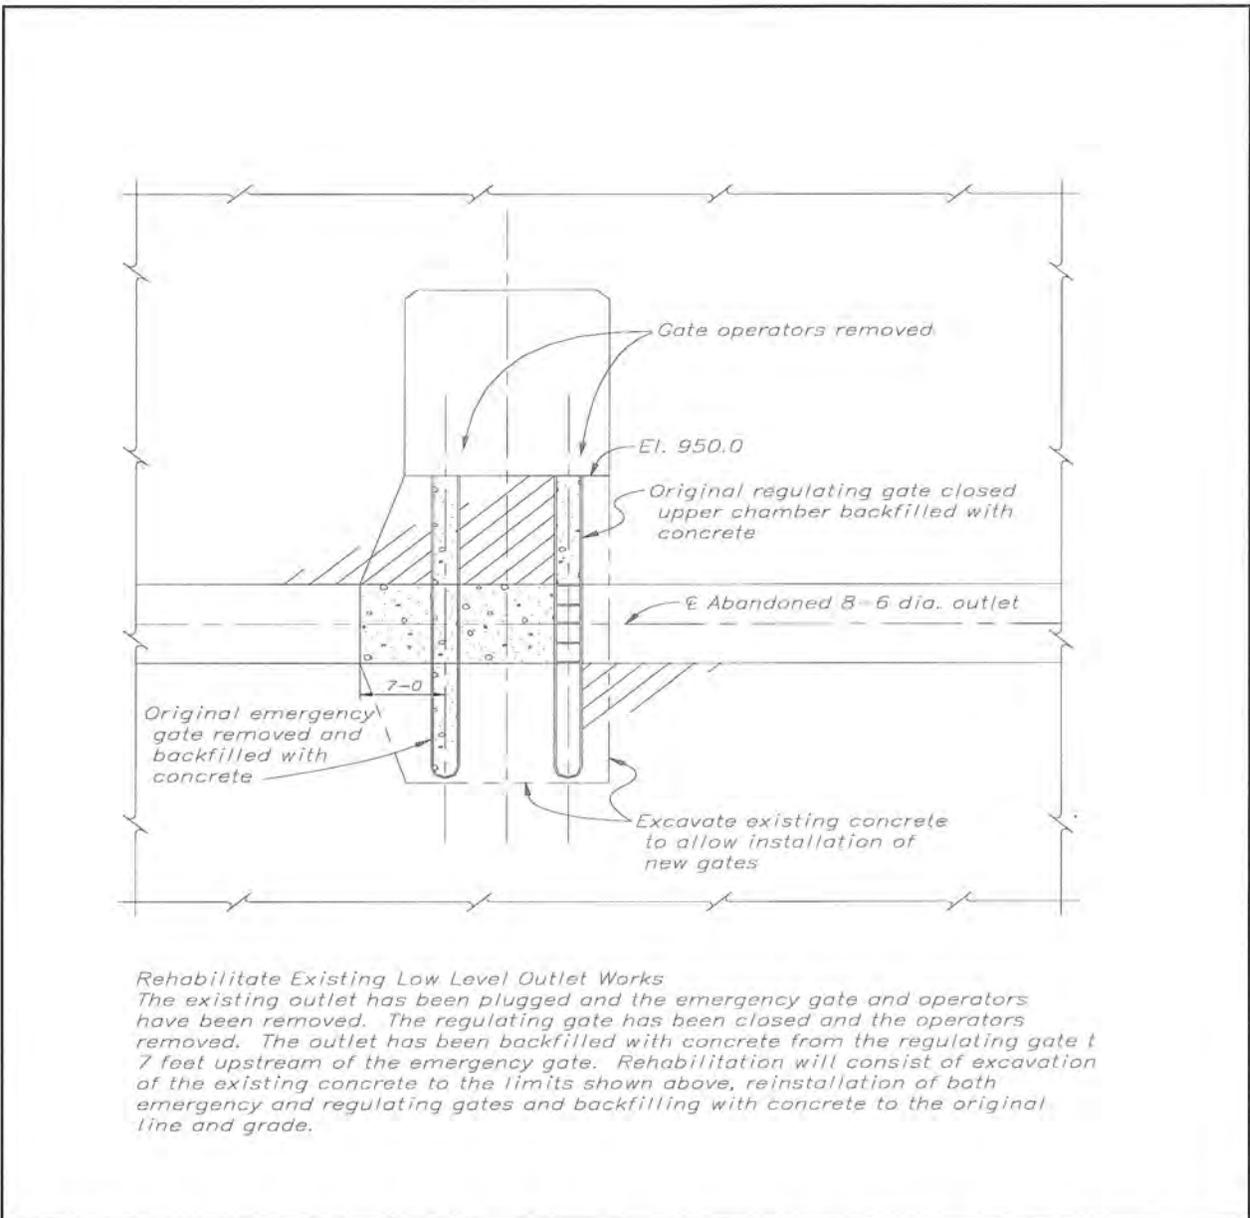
Existing condition of the low-level outlet works and the required limits of excavation to reopen the conduits. (fn:rehab.wp)
